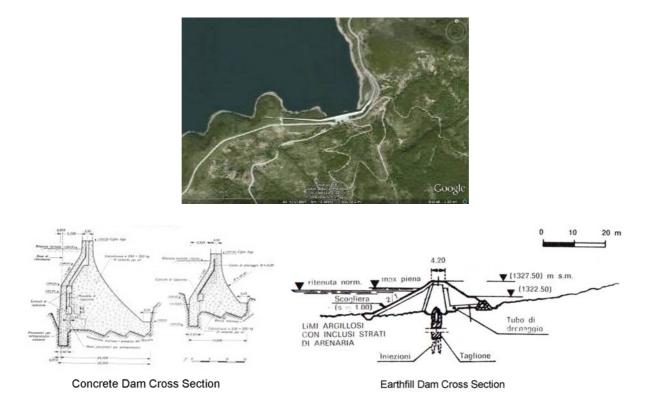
Plan and cross sectional (concrete dam cent ral portion, e arthfill embankment end portion) views of Sella Pedicate (42.514954°N, 13.369194°E) dam and adjacent highway system.
